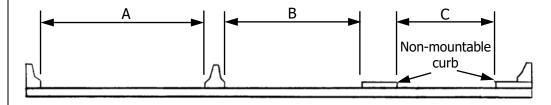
Cross-section view of a bridge deck with non-mountable curb and median barrier.
